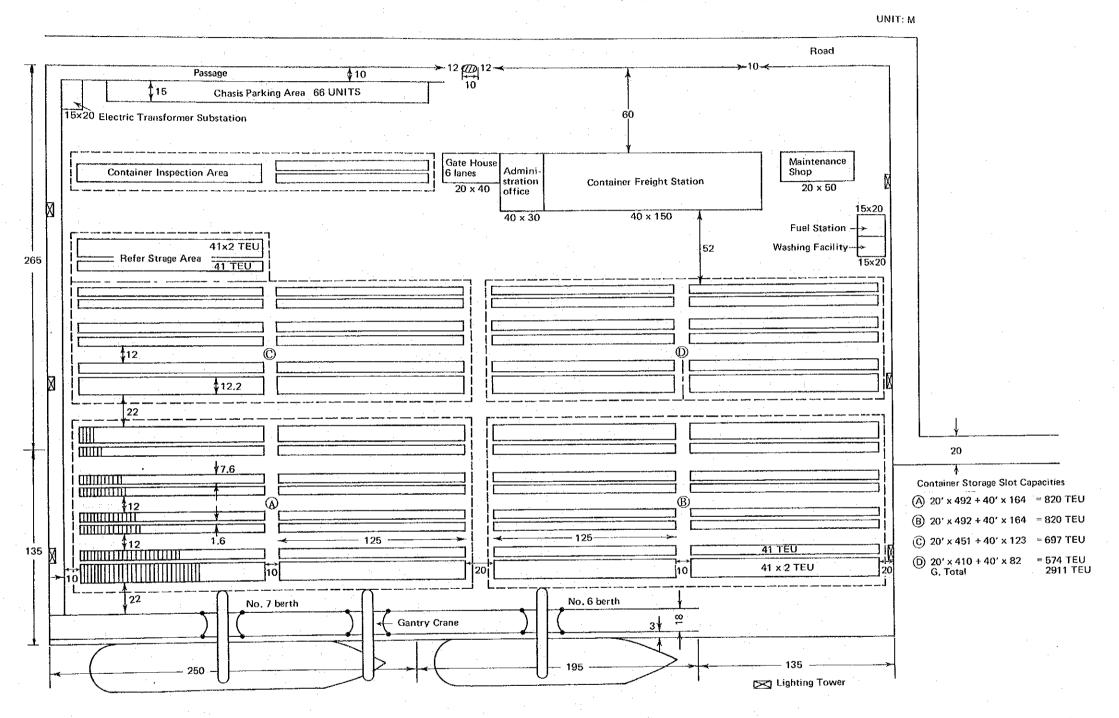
Basic Layout of Straddle Carrier System
